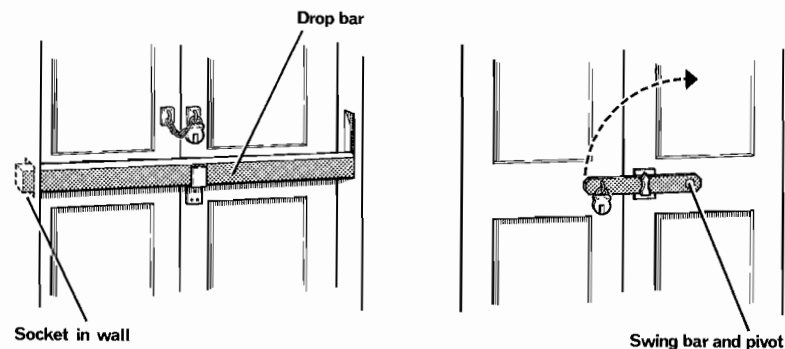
Common types of drop bar. Left: removable type. Right: swing type.
